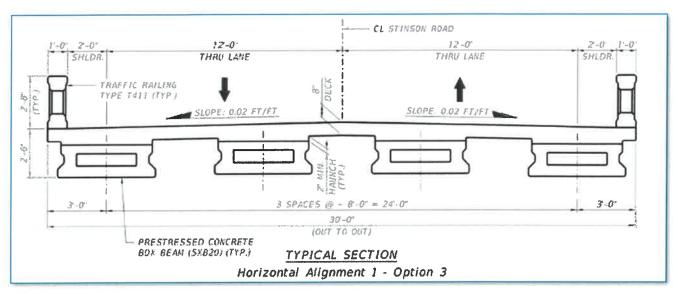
TxDOT Prestressed Concrete XBeams (5XB20) Typical Section
